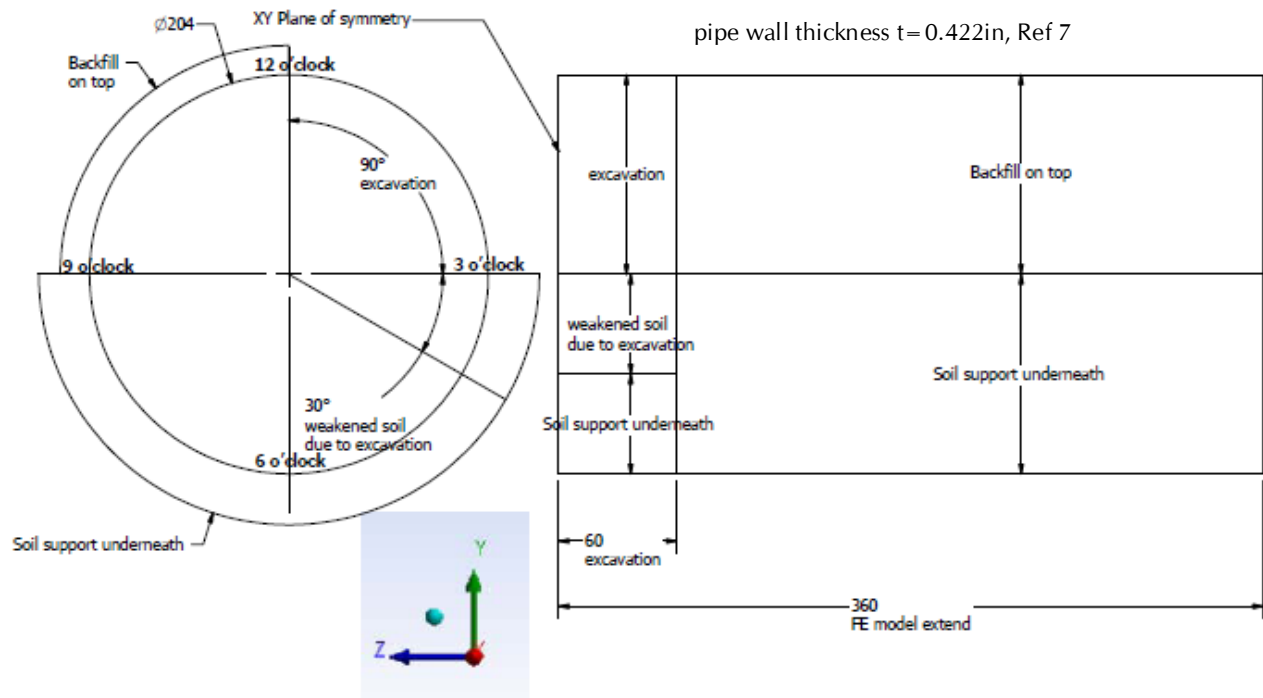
Finite element model dimensions, inches. 60ft long pipe with soil support at the bottom half. Top soil pressure on the top half. Excavation extend from 12 to 3 o'clock 10 ft long. 30deg from 3 o'clock 10 ft long is considered weakened soil (very low K_s value) and is assumed to be part of the excavation. Middle of the excavation is a plane of symmetry thus only half of 60 ft pipe was modeled
